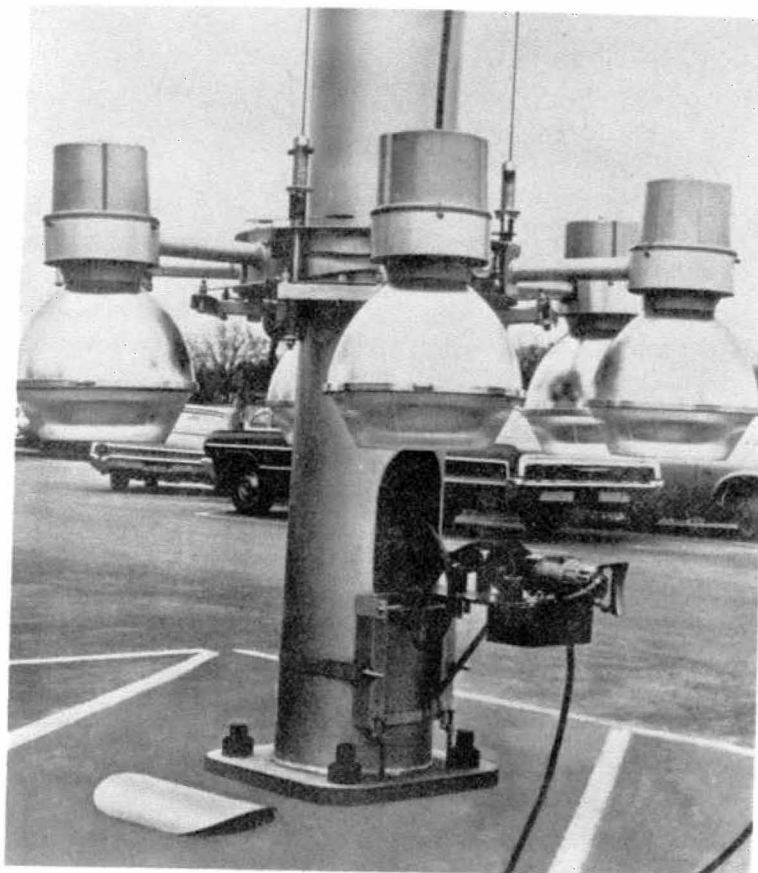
A heavy-duty, industrial-type drill for attachment to high mast winch.
